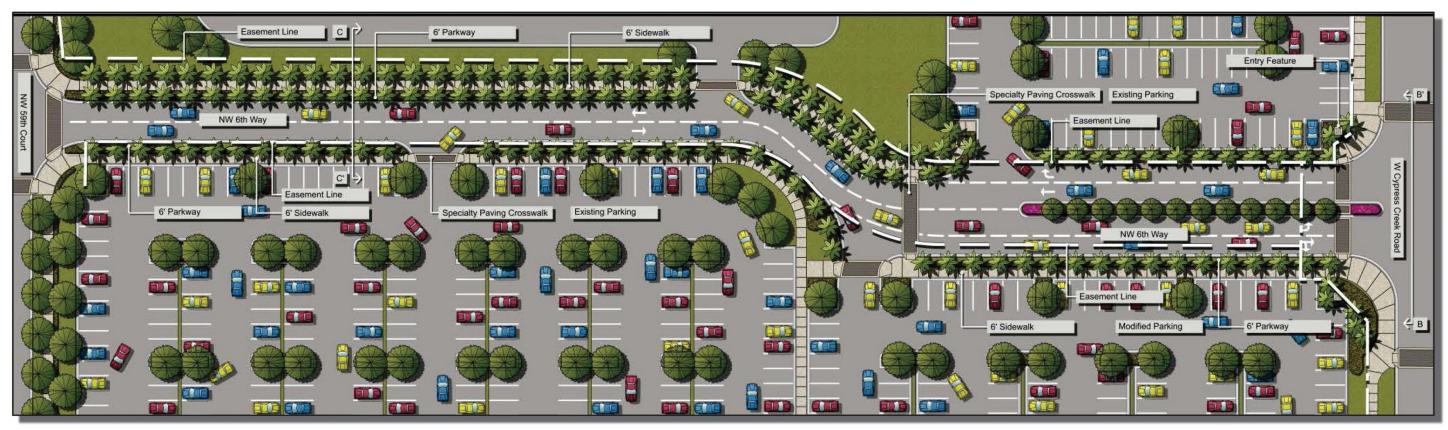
NW 6<sup>th</sup> Way (Northern Section)
